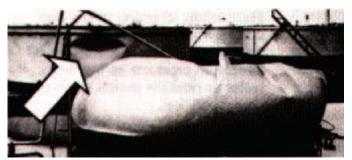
Water wave from collapsed spheroid overflowed fire wall and damaged tank in the background.
